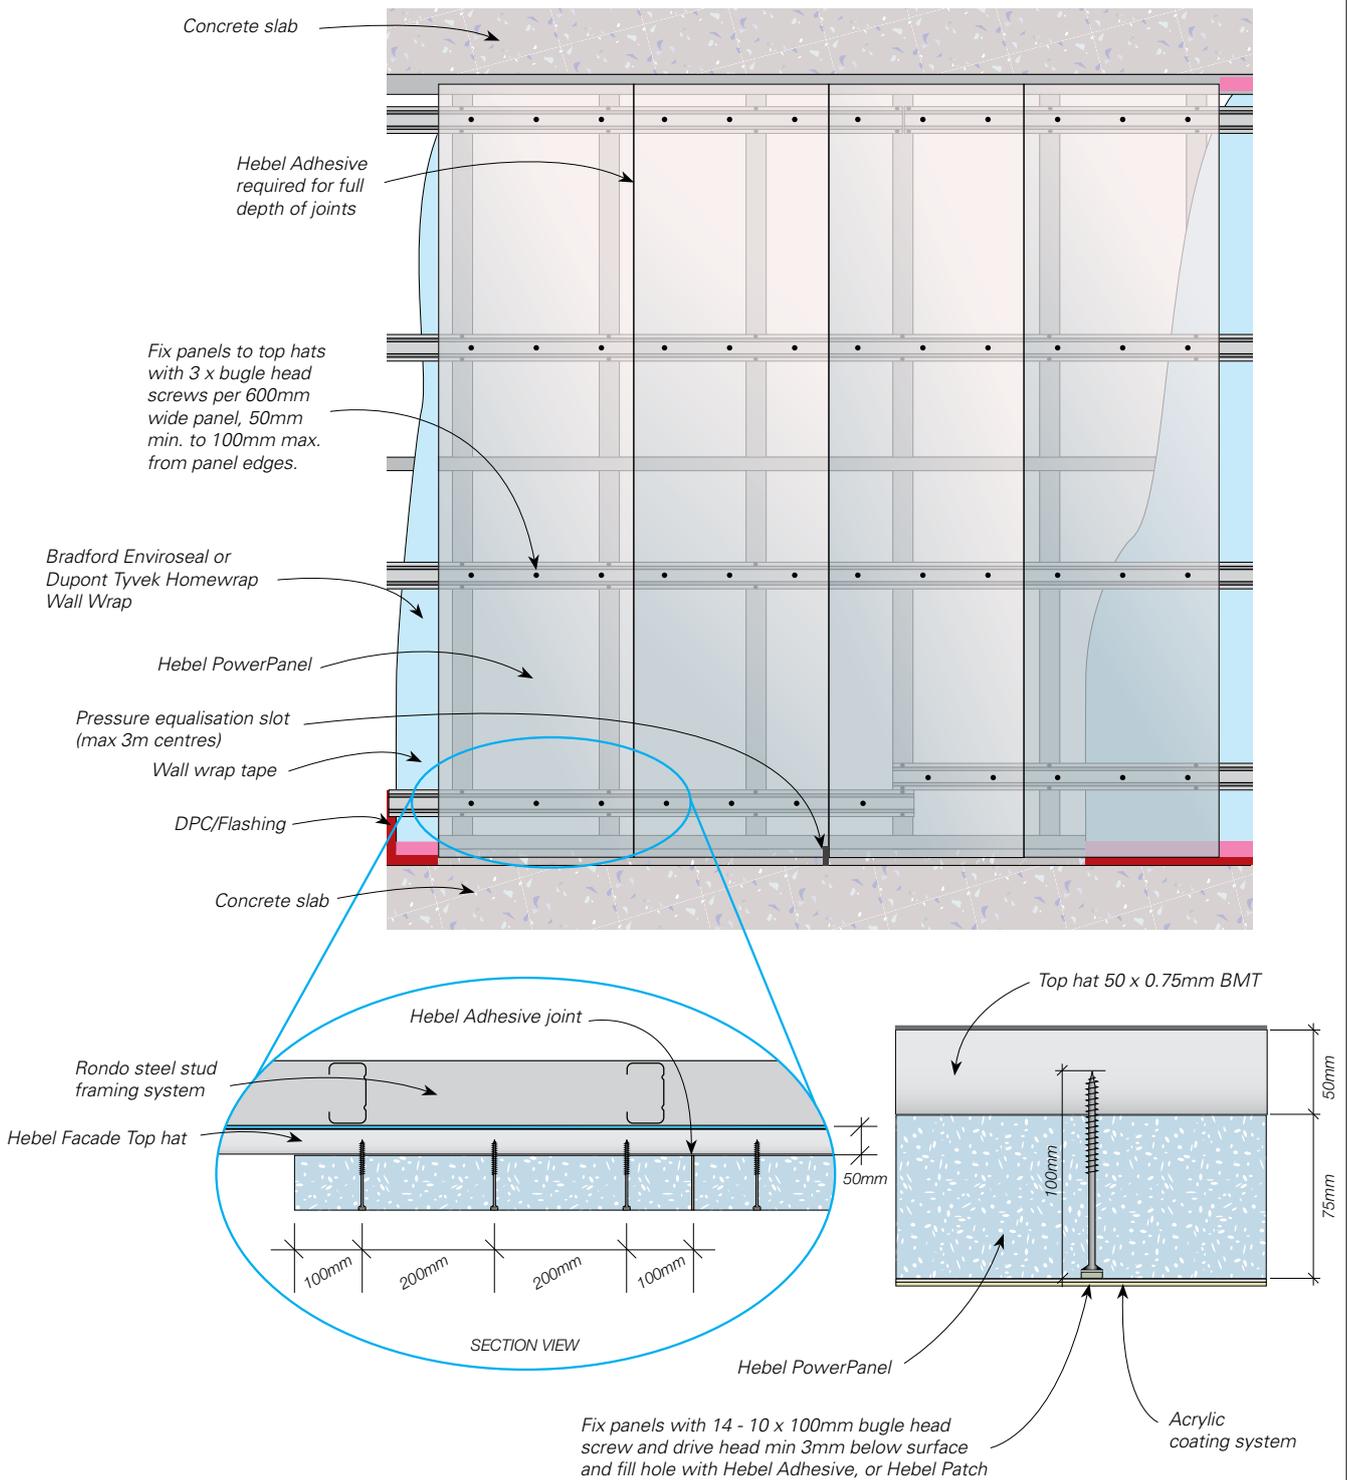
PowerPanel fixing to top hats (Visible slab edge detail shown)
